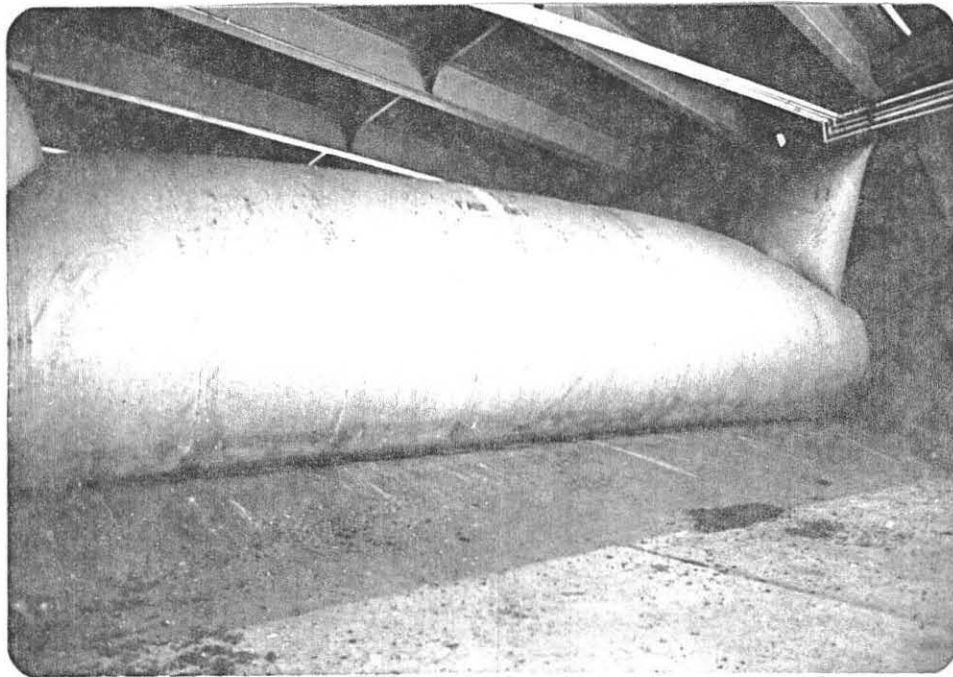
Downstream view of 10-ft. high Fabridam.
